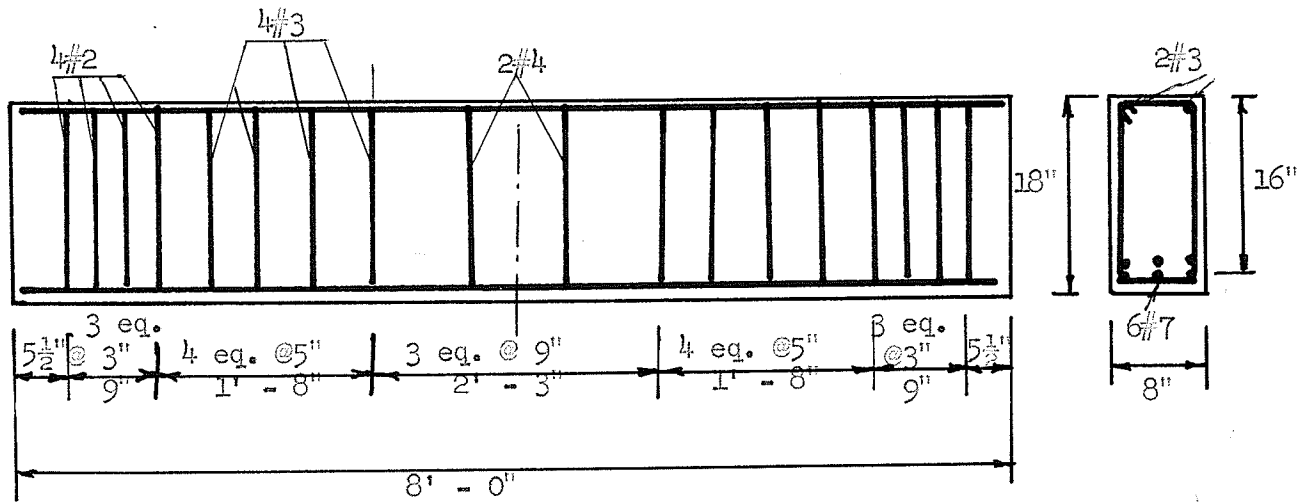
SKETCH OF REINFORCEMENT BEAM 4
